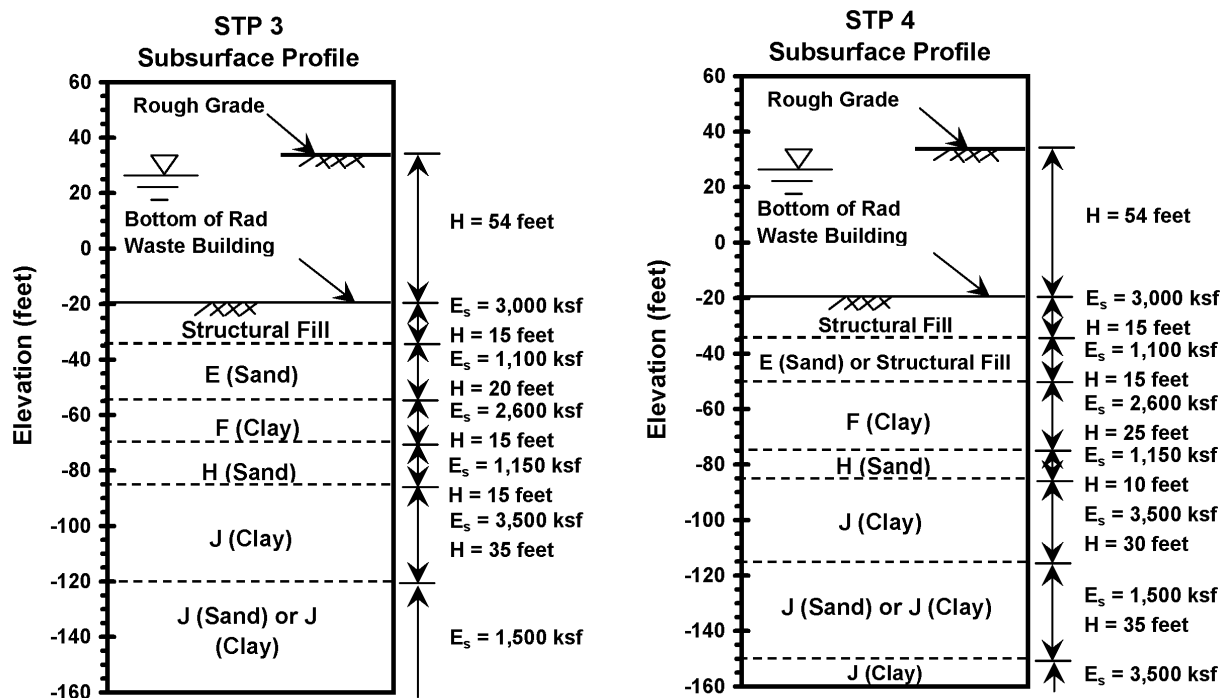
S.4-69 Adopted Subsurface Profiles for the STP 3 & 4 Radwaste Buildings
